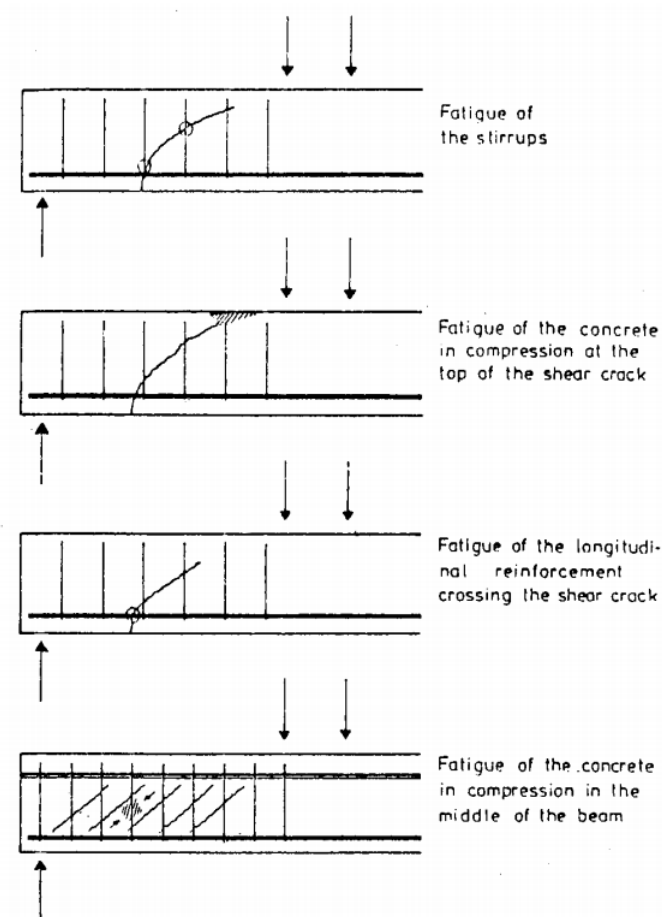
Possible types of shear fatigue failure in beams with shear reinforcement (RILEM 1984)
